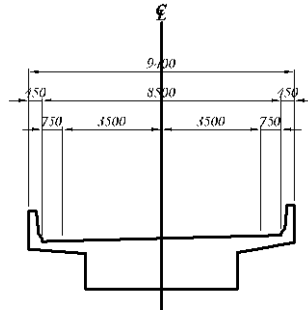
Typical Cross Section for Ramp (2-lane, Bridge)
